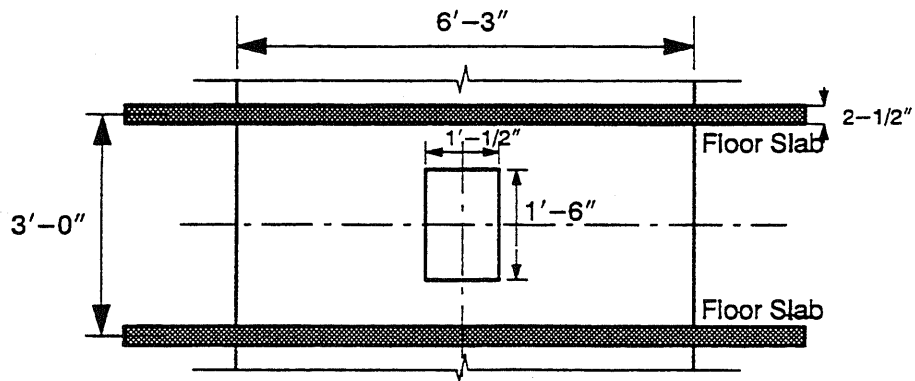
Location and Dimensions of Openings in Wall PW1
